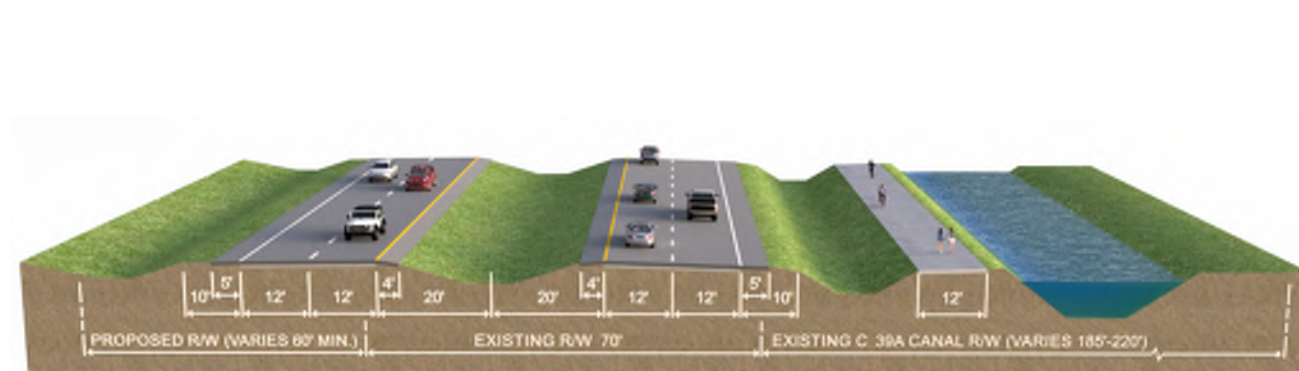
SR 70 – Proposed Roadway Typical Section Two
